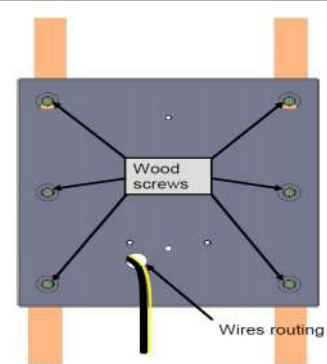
Fix optional plate with 6 lag screws using 17mm box spanner.
